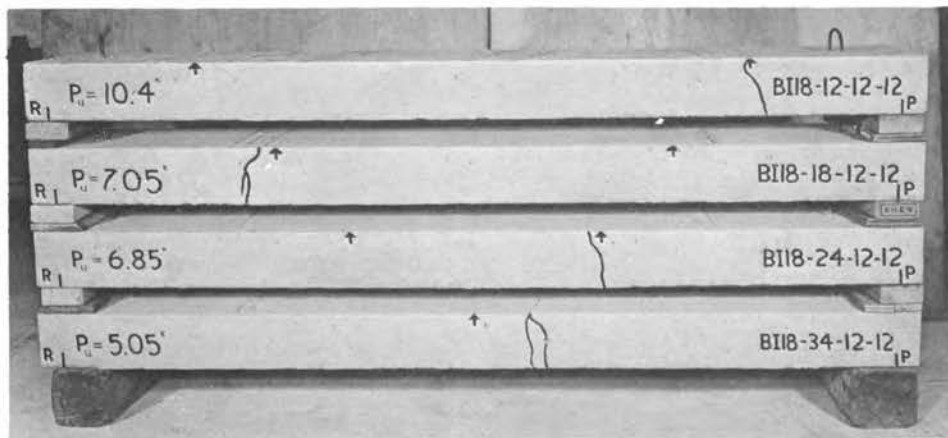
Failed beam specimens for casting numbers 11 and 12 using 18-gage steel form I.
